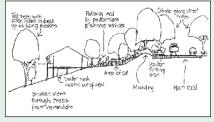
Siting of Built Elements so as to ensure that buildings, structures and roadways integrate into the landscape.
